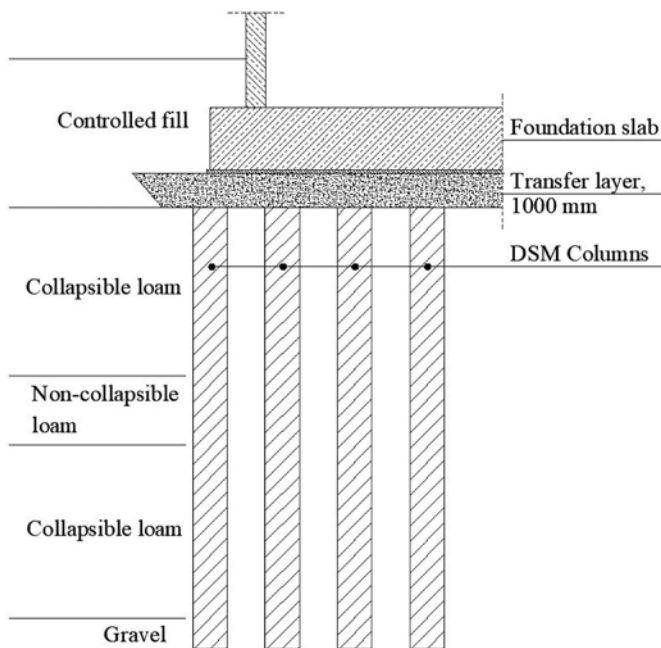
Soil improvement with DSM technology under the 16 floor residential building – cross section.
